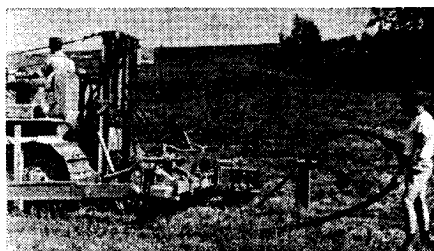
Corrugated plastic drain tubing being installed with hollow-bladed tool drawn behind a mole plow. This material could be fed from a coil mounted on the equipment
